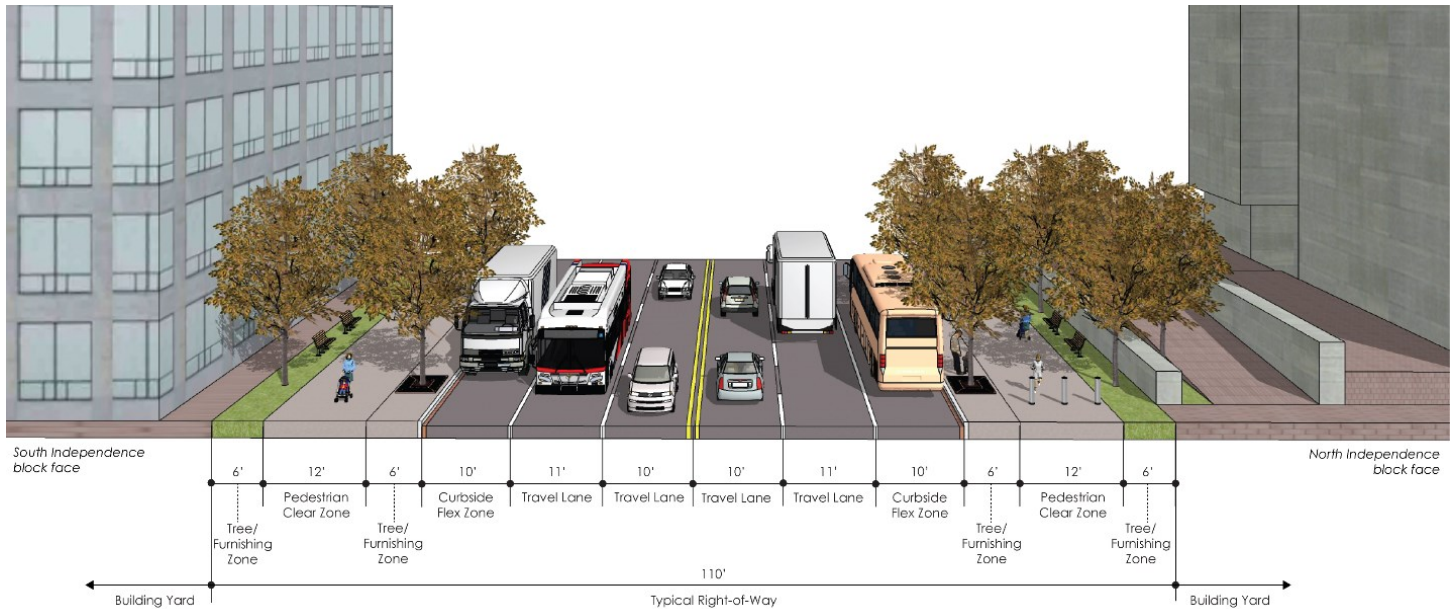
Typical Section for Concept 1 Curbside Flex Zones
